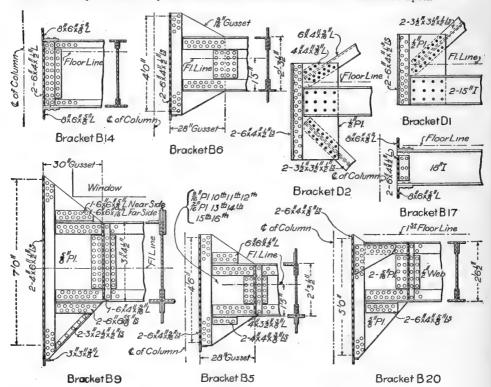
Details of Wind Bracing in United Fire Company's Building. (Eng. Record, Dec. 9, 1911.)
